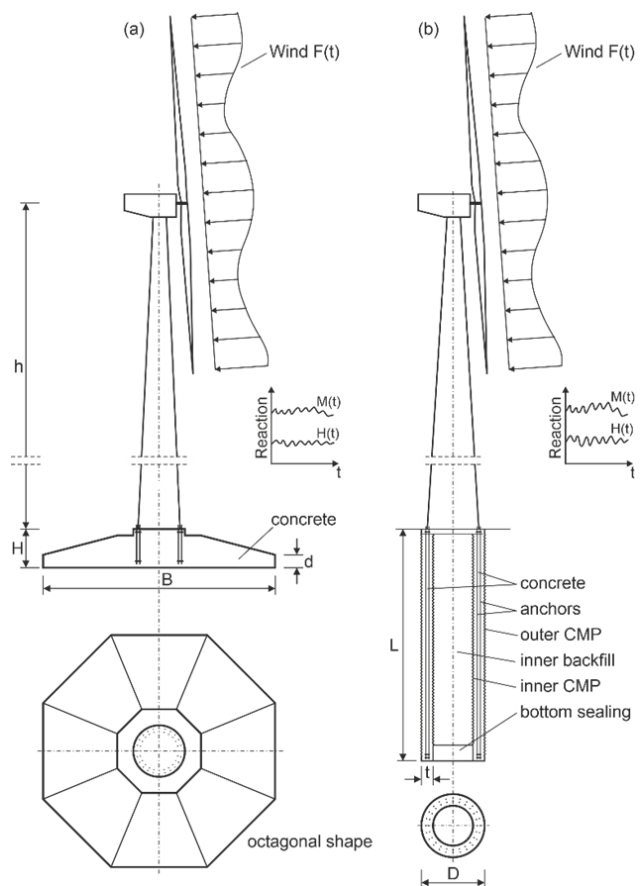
Schematic sketch of shallow foundation (a) and pier foundation (b)
